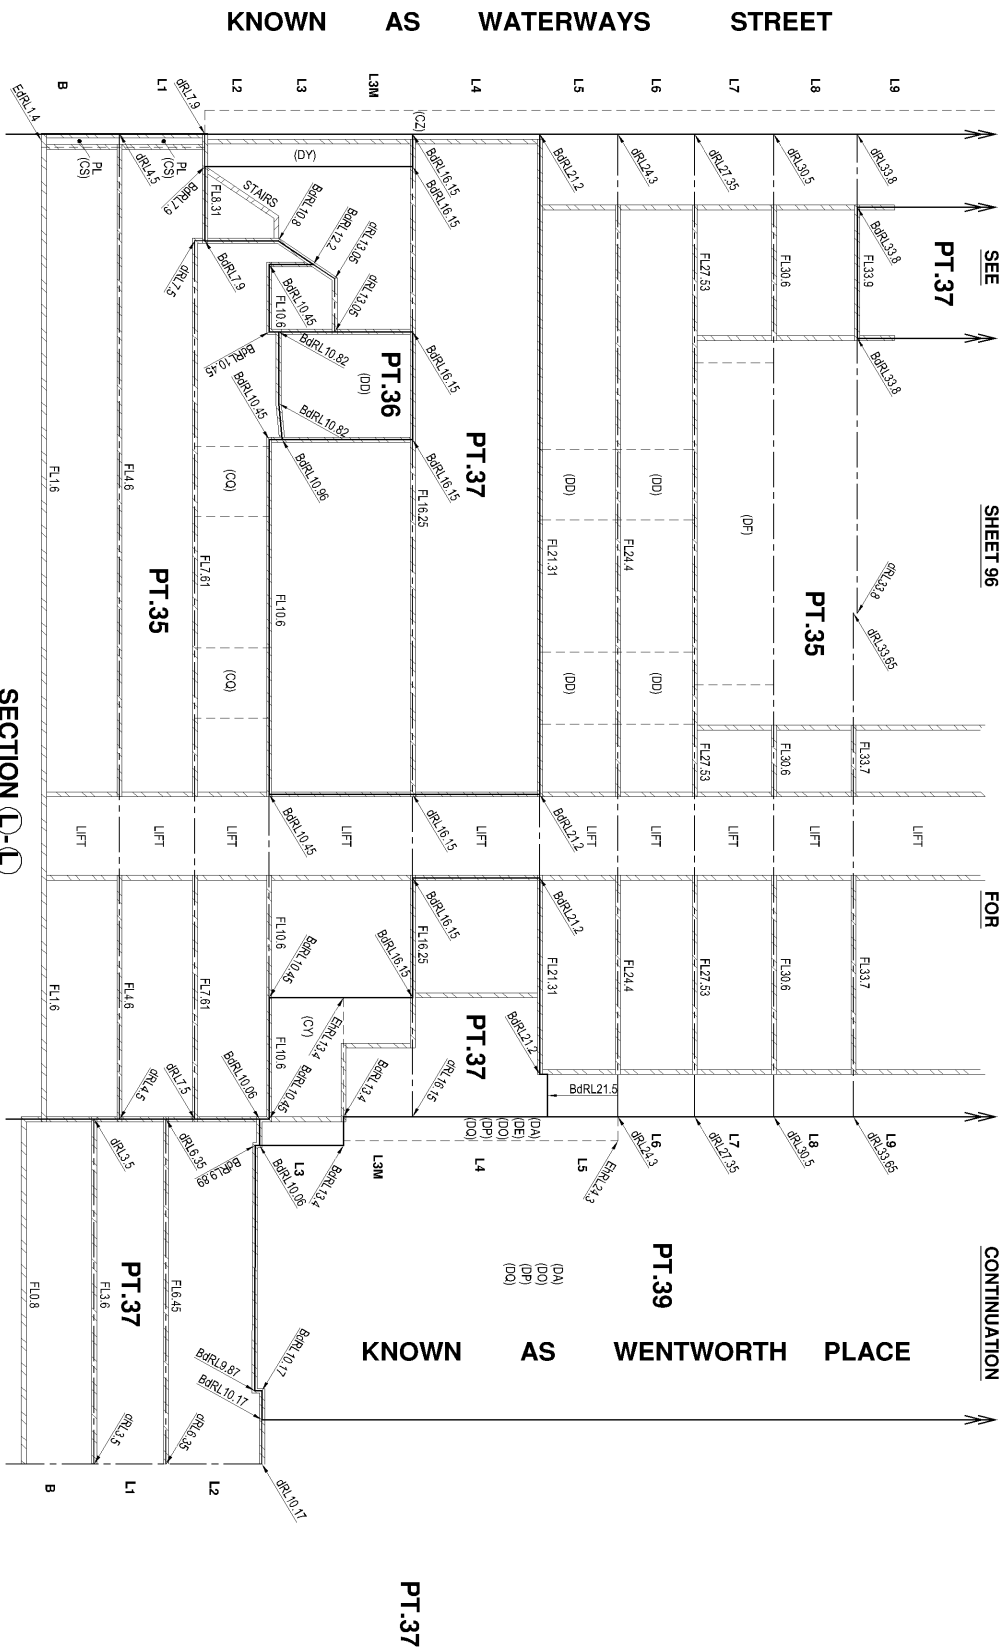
DETAIL PLAN (SHEET 95 OF 97 SHEETS)
